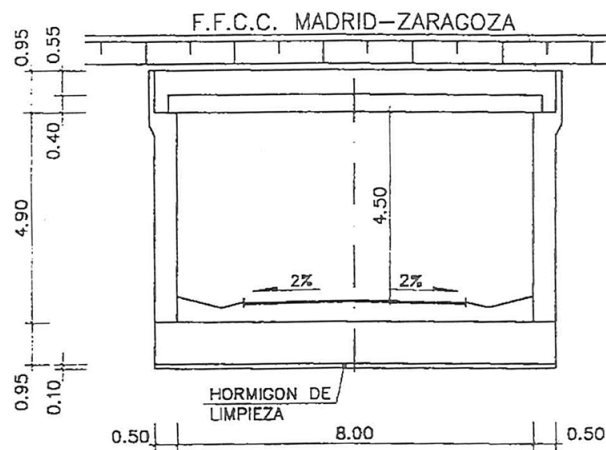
Bridge PI024, cross-section B-B along the bridge.
